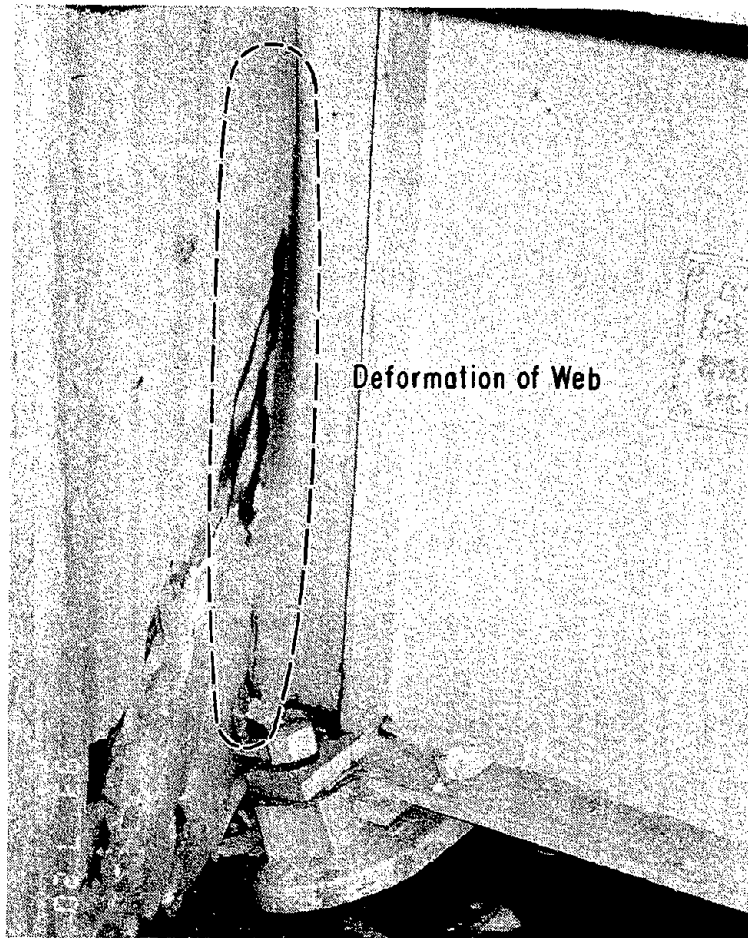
Crash of Girder to Parapet and Deformation of Web and Rotation of Bearings (Kamiisoshin Bridge)
